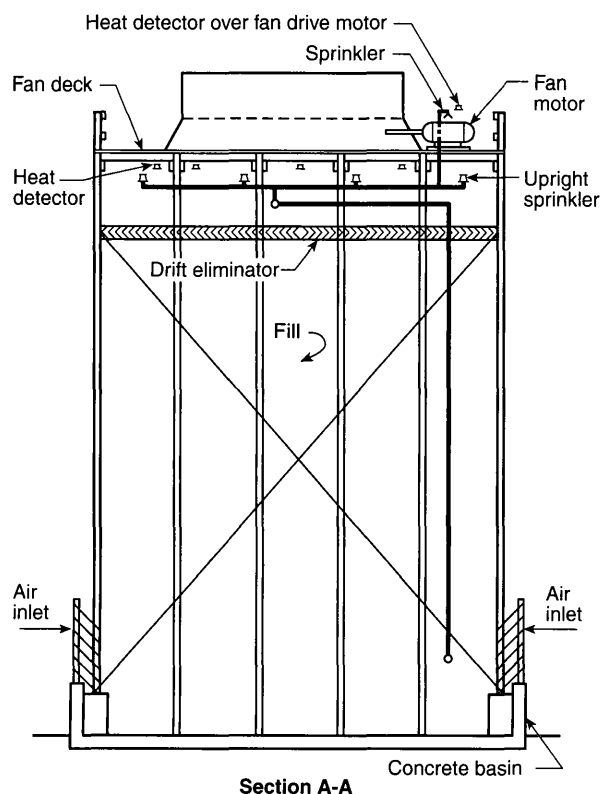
(c) Typical Deluge or Dry Pipe Fire Protection Arrangement for Counterflow Towers, Illustration 1. [214: Figure A.3.2.4.1(c)]
